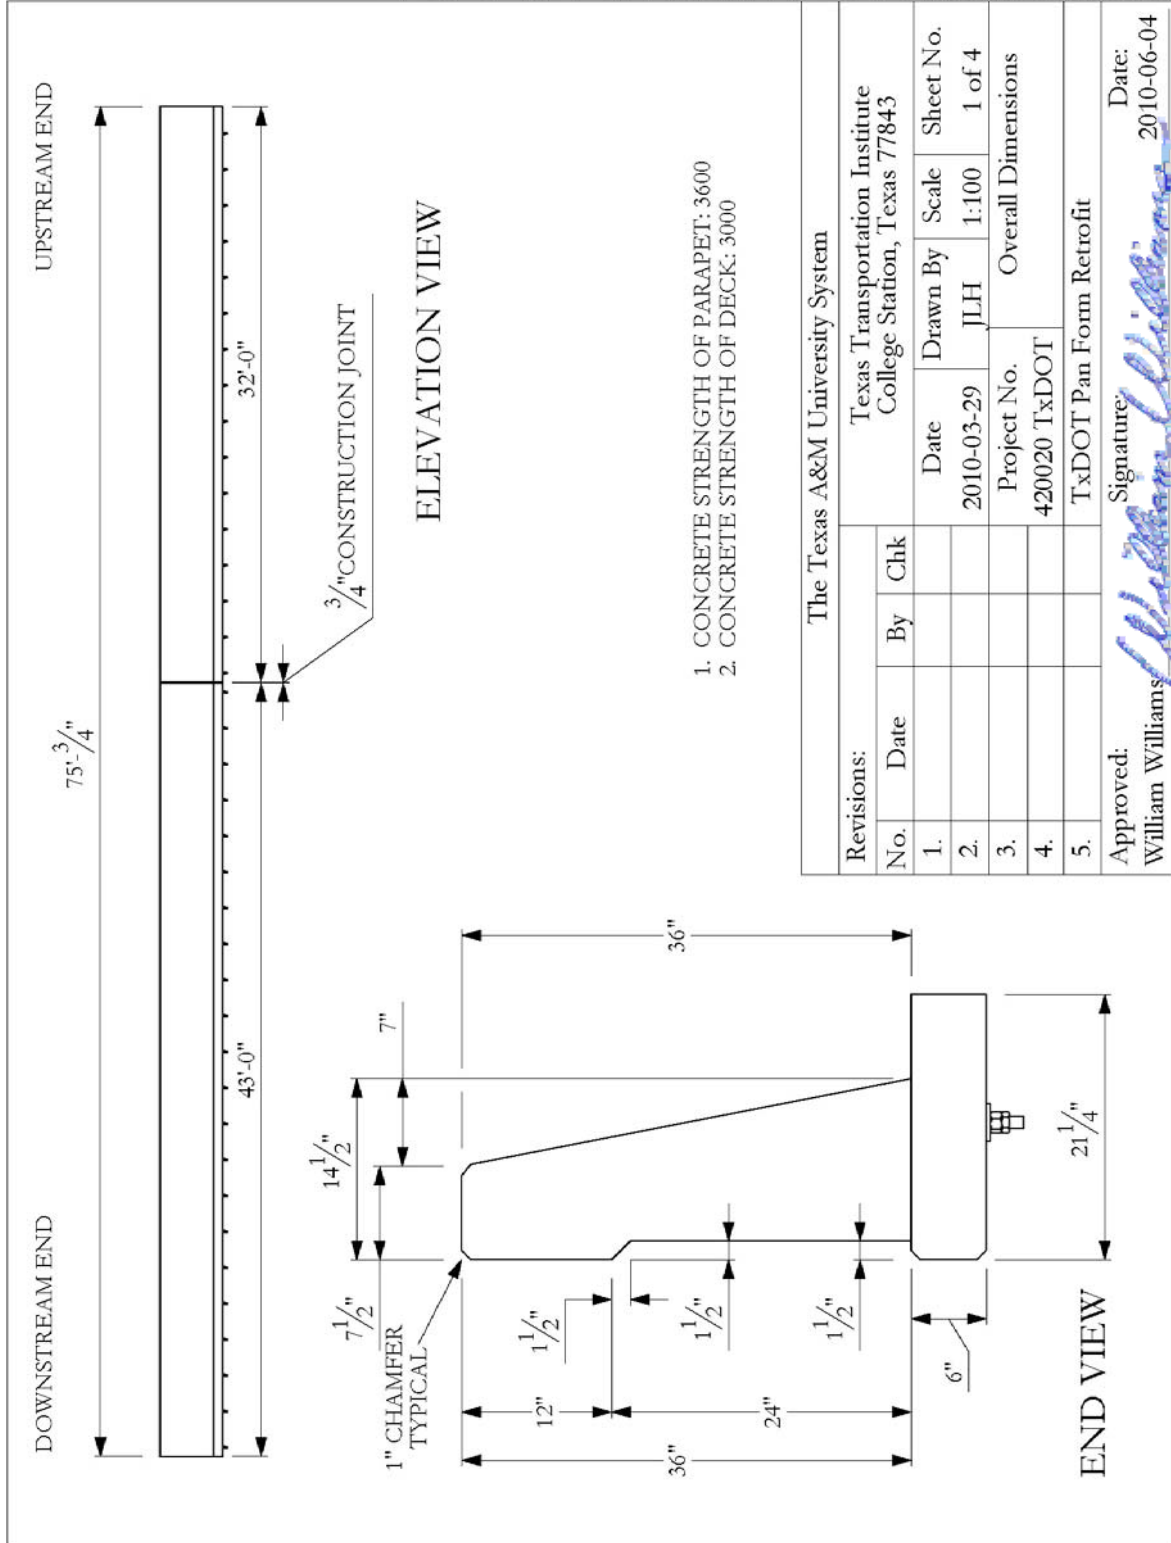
Details of the TxDOT Pan-Formed Bridge Rail Installation.
